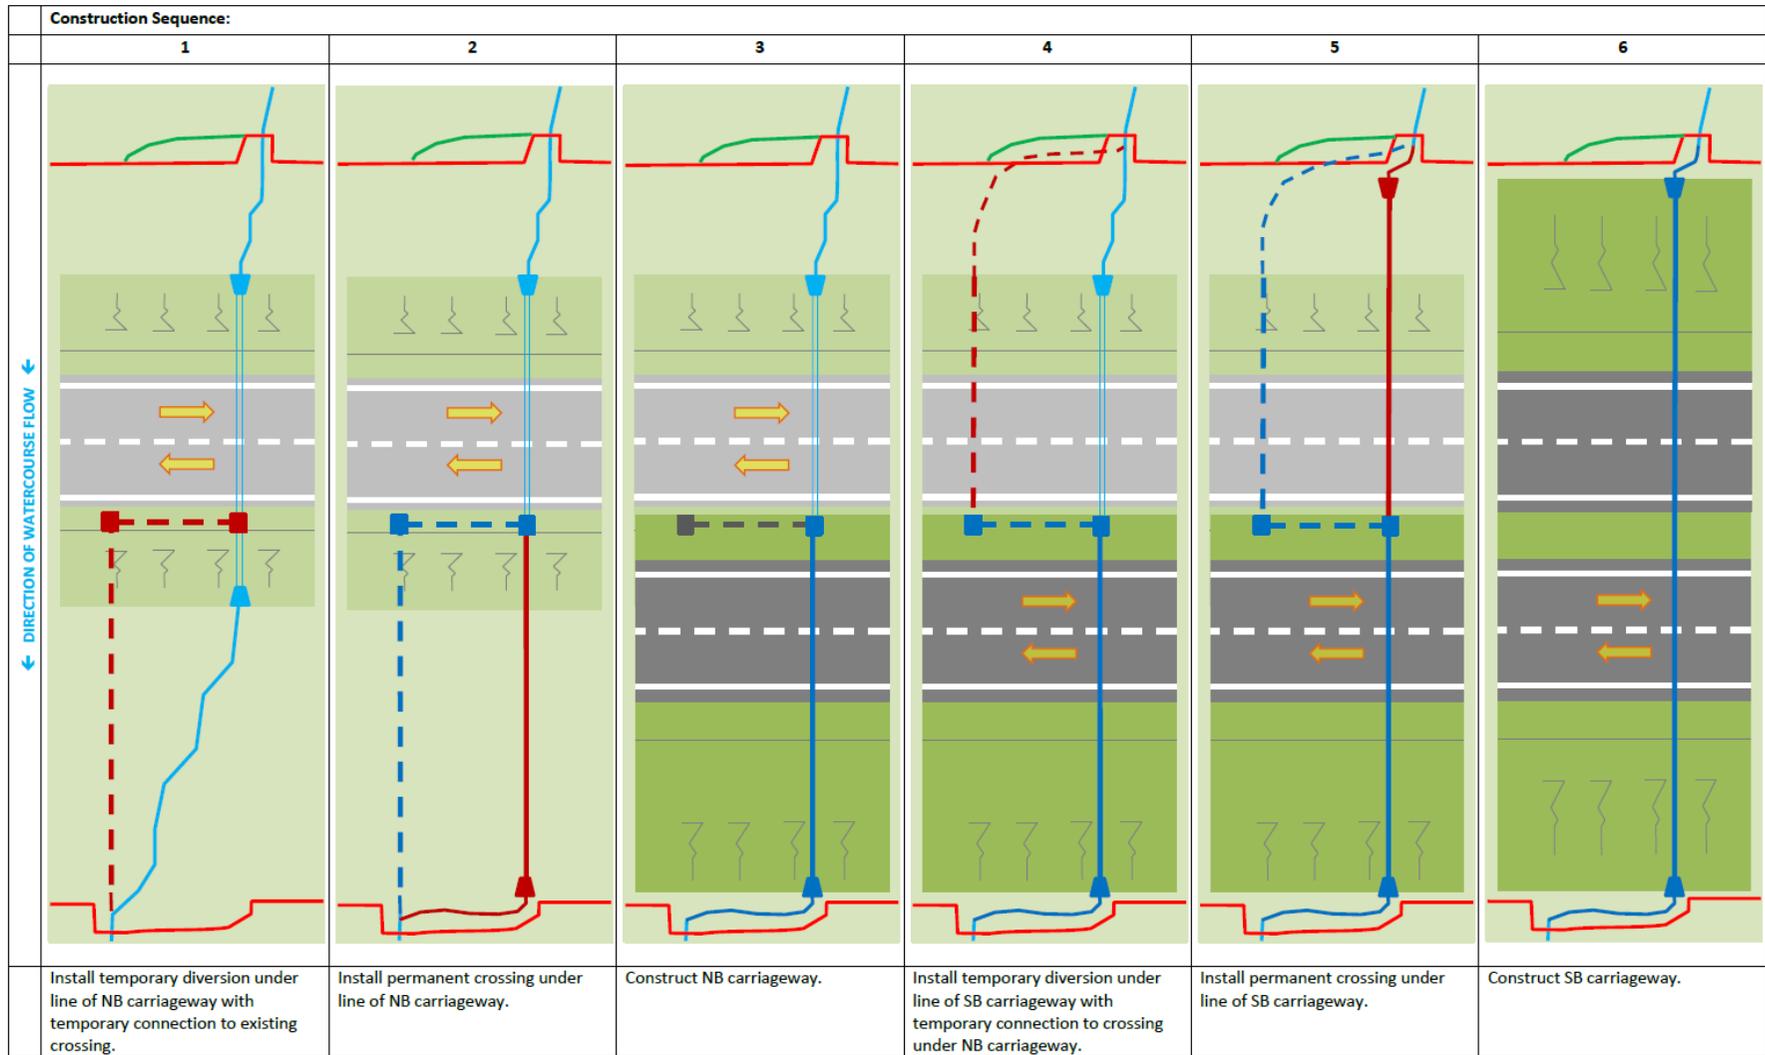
Widening to the west – road on embankment – on-line watercourse alignment
